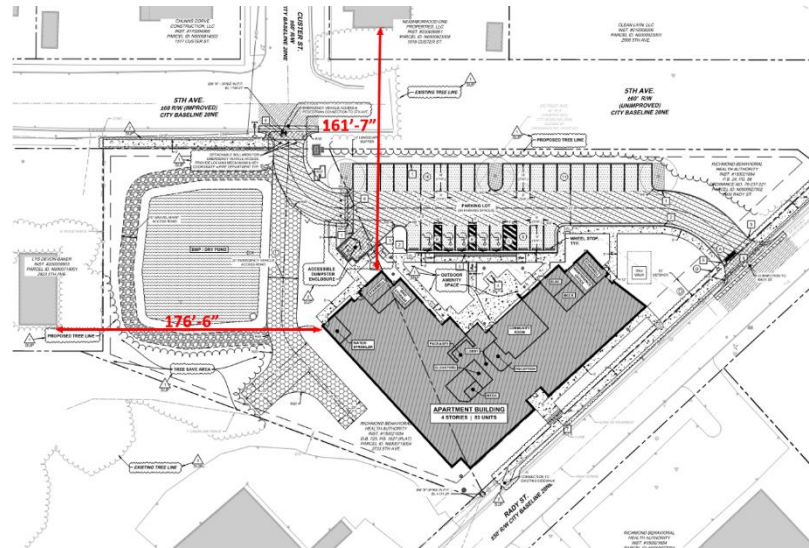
Site Plan Layout Showing Distance to Nearest Residential Uses
